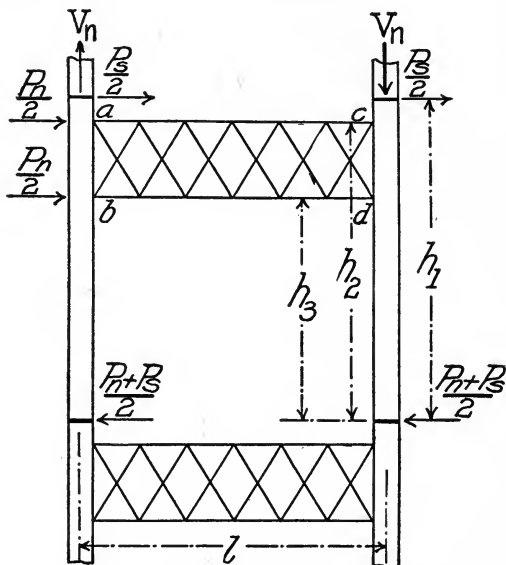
Figure showing Analysis of Lattice-girder Bracing.
